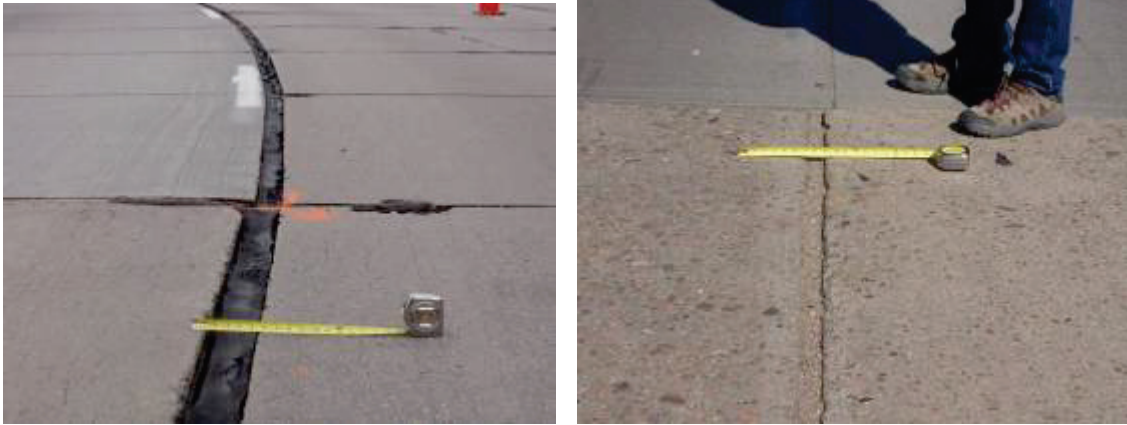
Excessive joint openings on Broadway Avenue (left) and Howe Street (right) in Douglas County, Colorado.
